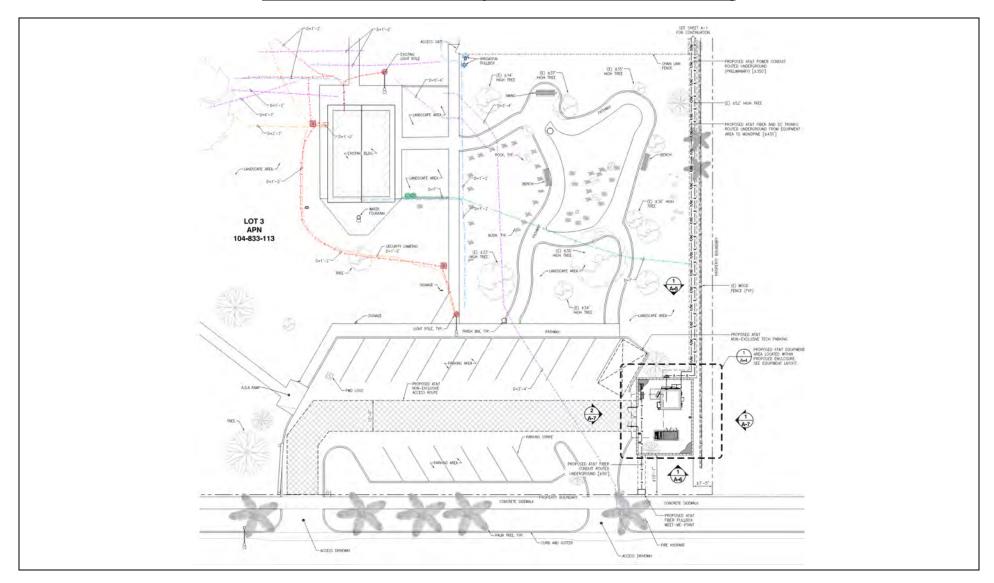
Exhibit C: ENLARGED SITE PLAN (MONOPINE LOCATION)
